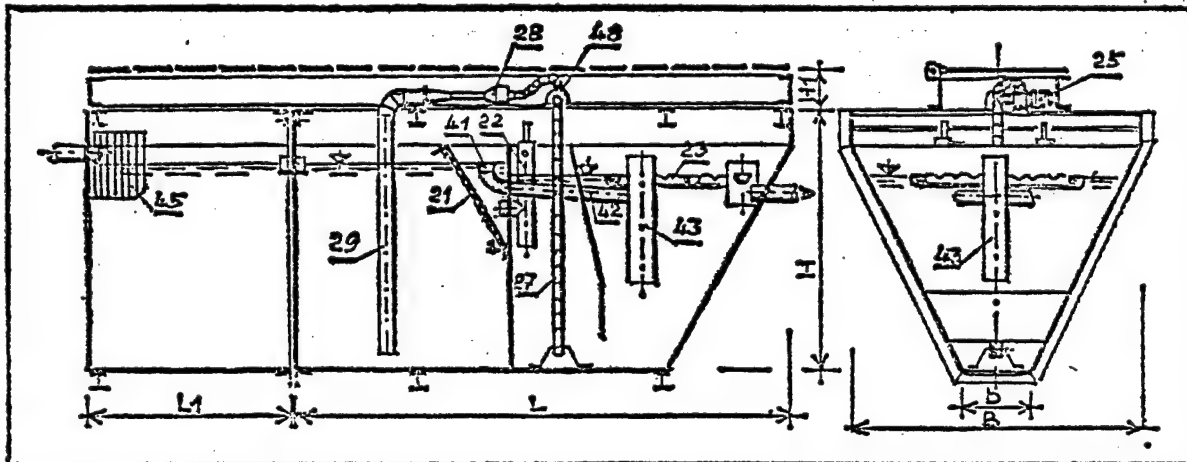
Cross Section of a Single-stage Wastewater Treatment Plant
